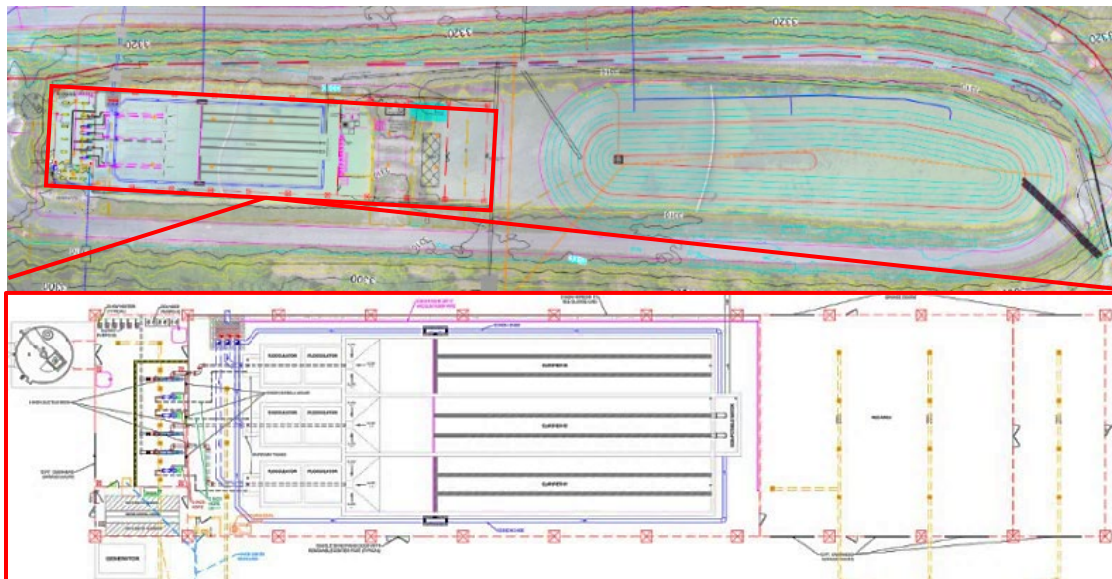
(top) Aerial view of site layout; pre-construction, and (bottom) plan view of proposed building construction.
